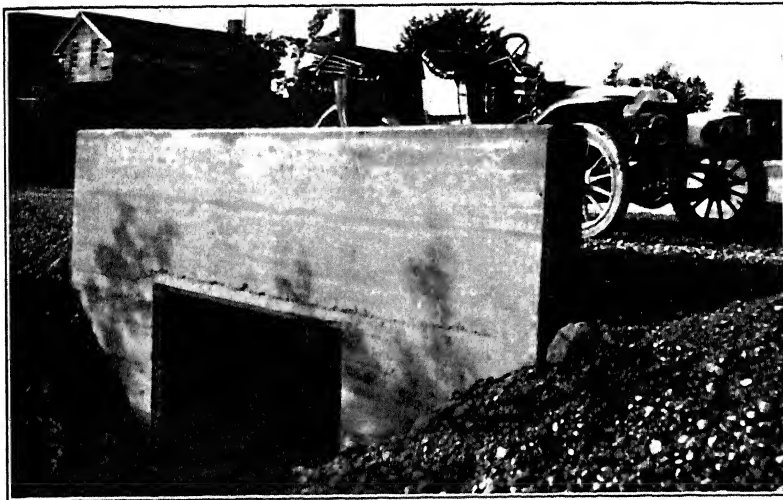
Simple concrete box culvert with straight high parapets (Town road construction).
